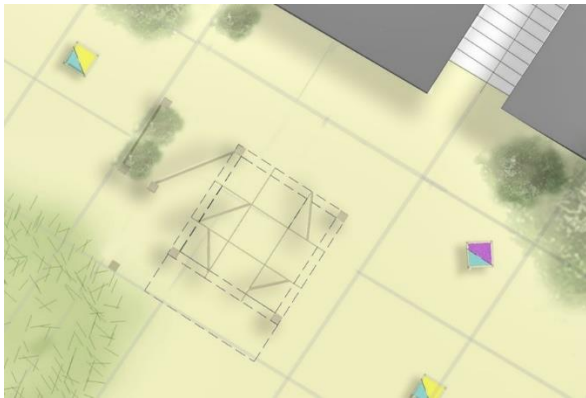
Ground floor exhibition plan (Source: Author, 2020)
